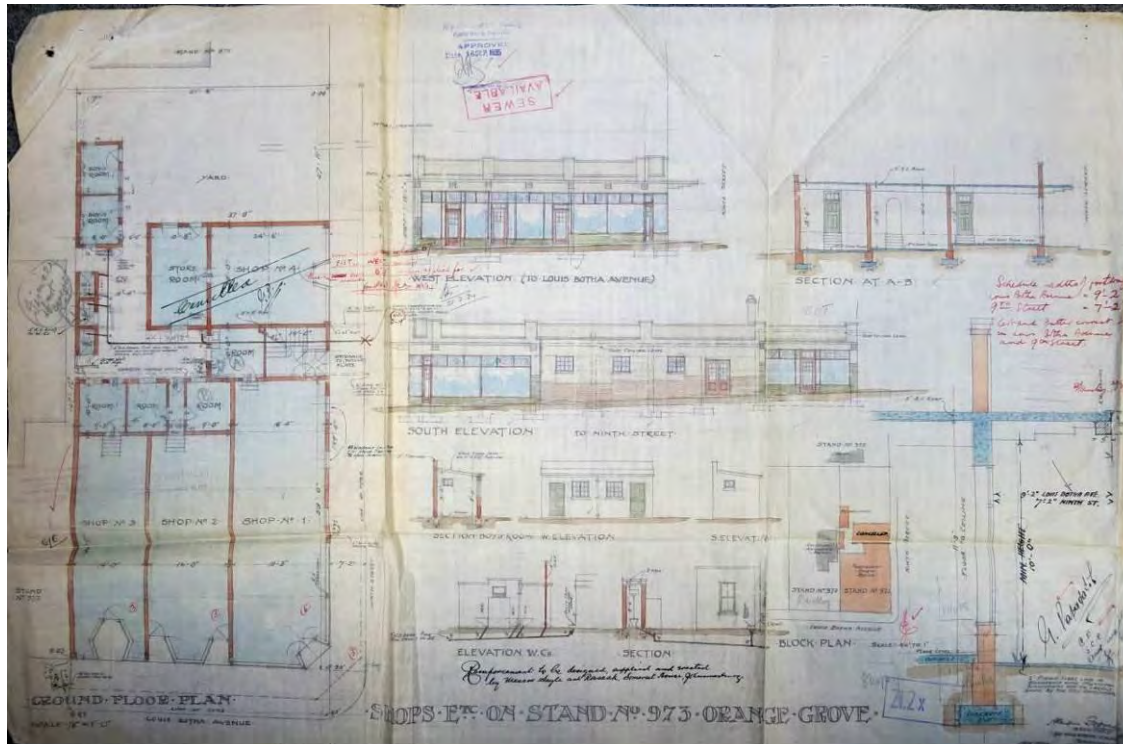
Original plan of proposed flats on stand 973, Orange Grove
